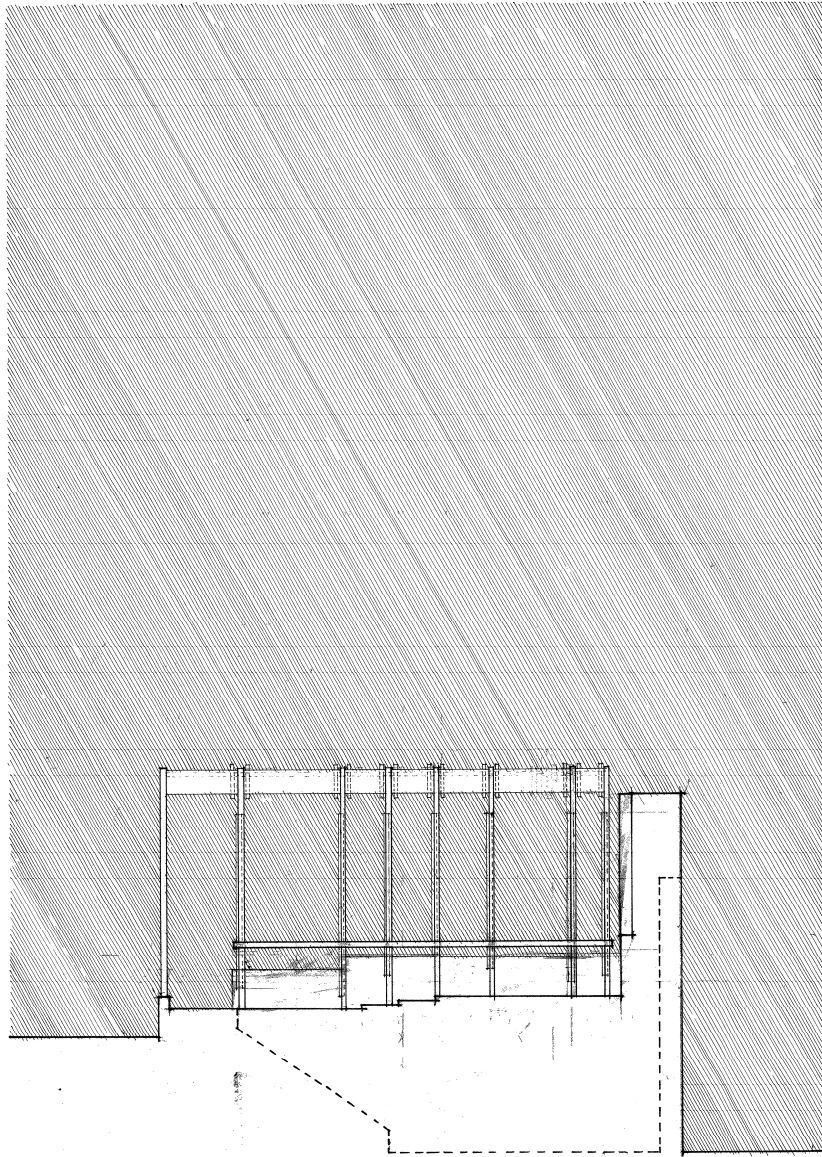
Proposed portico and chimes, west staircase, elevation to upper level garden.
